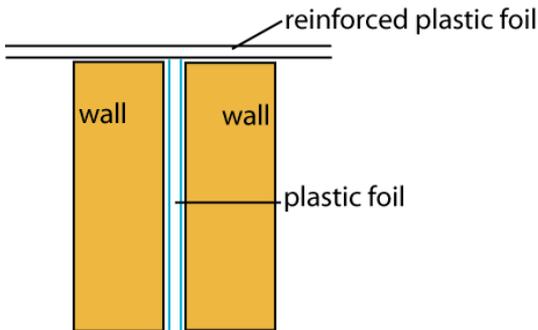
Plastic foil in internal walls meeting reinforced plastic foil in the attic.
